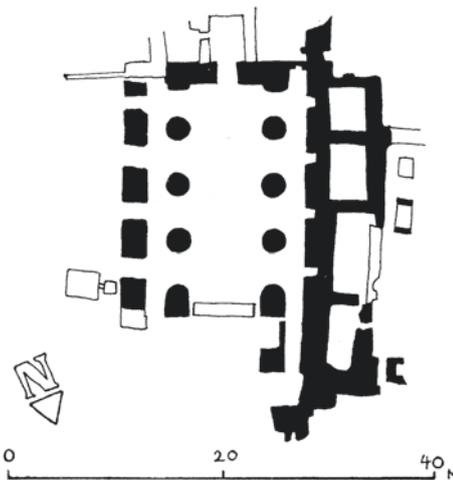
Chal Tarkhān, columnar hall, ground plan. – (After Kröger, Stuckdekor fig. 130. Detail).
